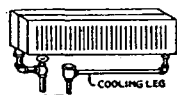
HORIZONTAL SECTIONAL FIN TYPE RADIATOR
